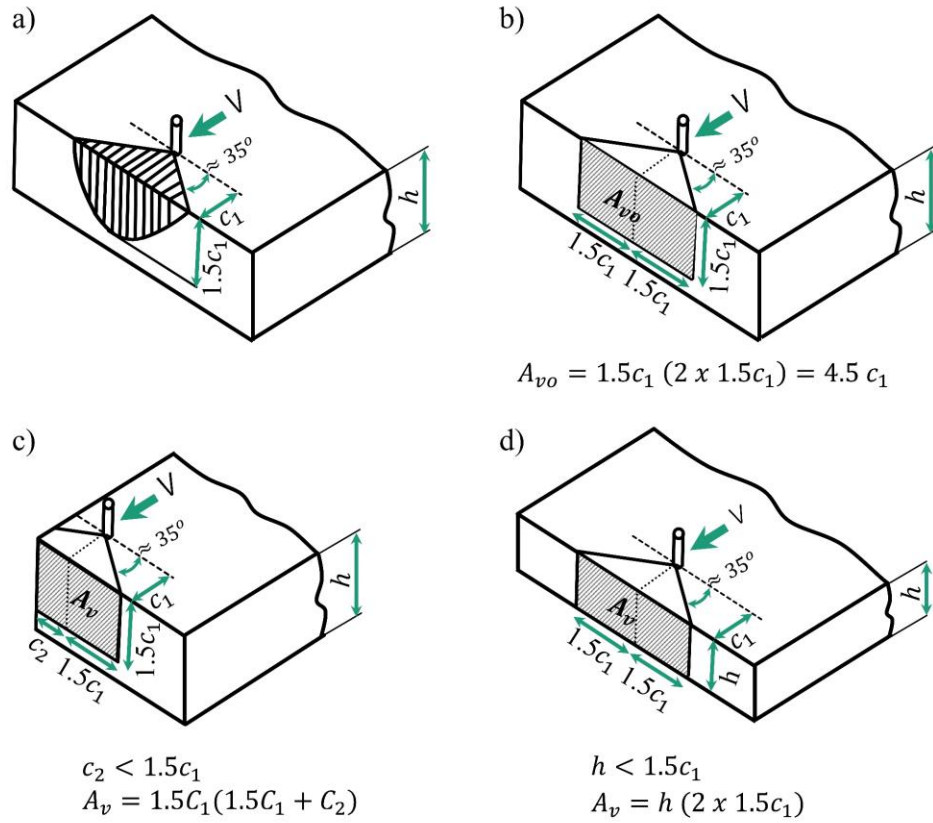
Anchors subjected to shear load a) Idealized failure surface for single anchor per CCD b) projected area for single anchor in thick concrete c) projected area for single anchor close to corner d) projected area for single anchor in thin concrete member.
